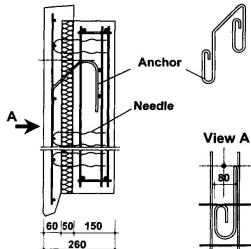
Structure of the external wall - type WBS 70 in cross section
